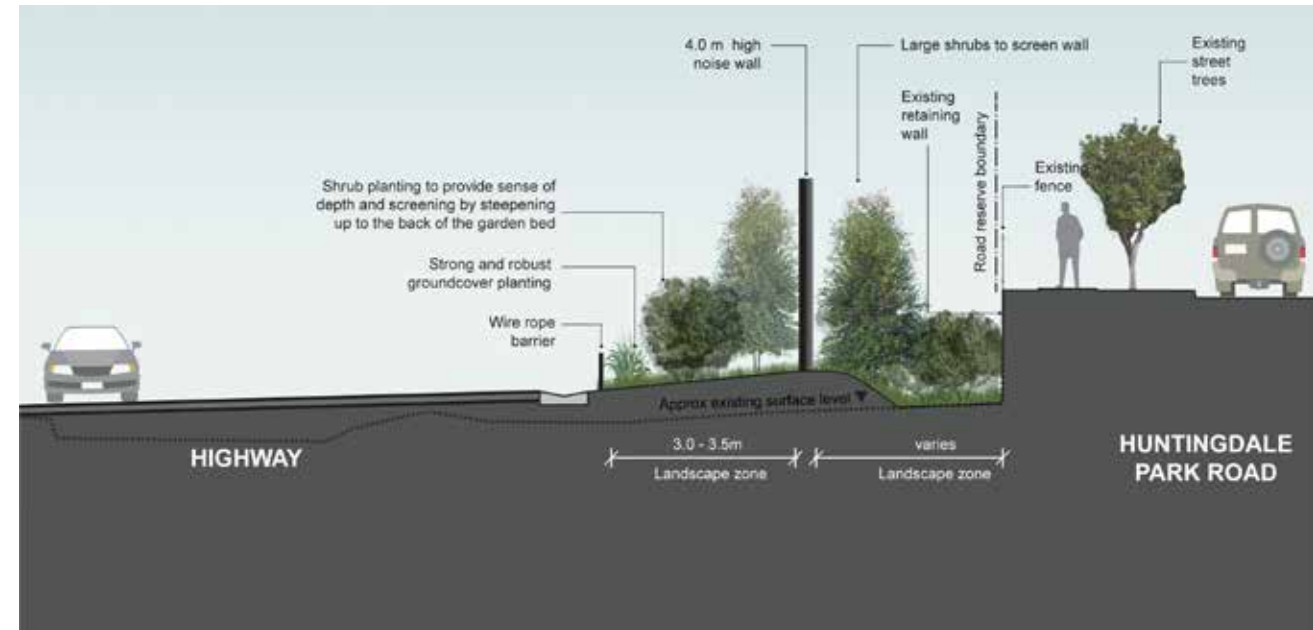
Huntingdale Park Road noise barrier NB02 - Option considered. Typical cross section
